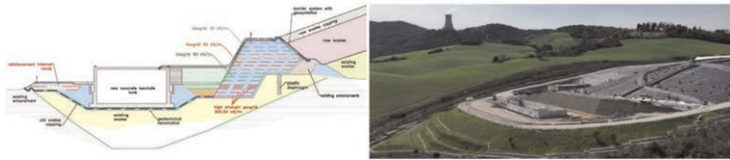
Typical section and view of the treatment tank and reinforced embankment.
